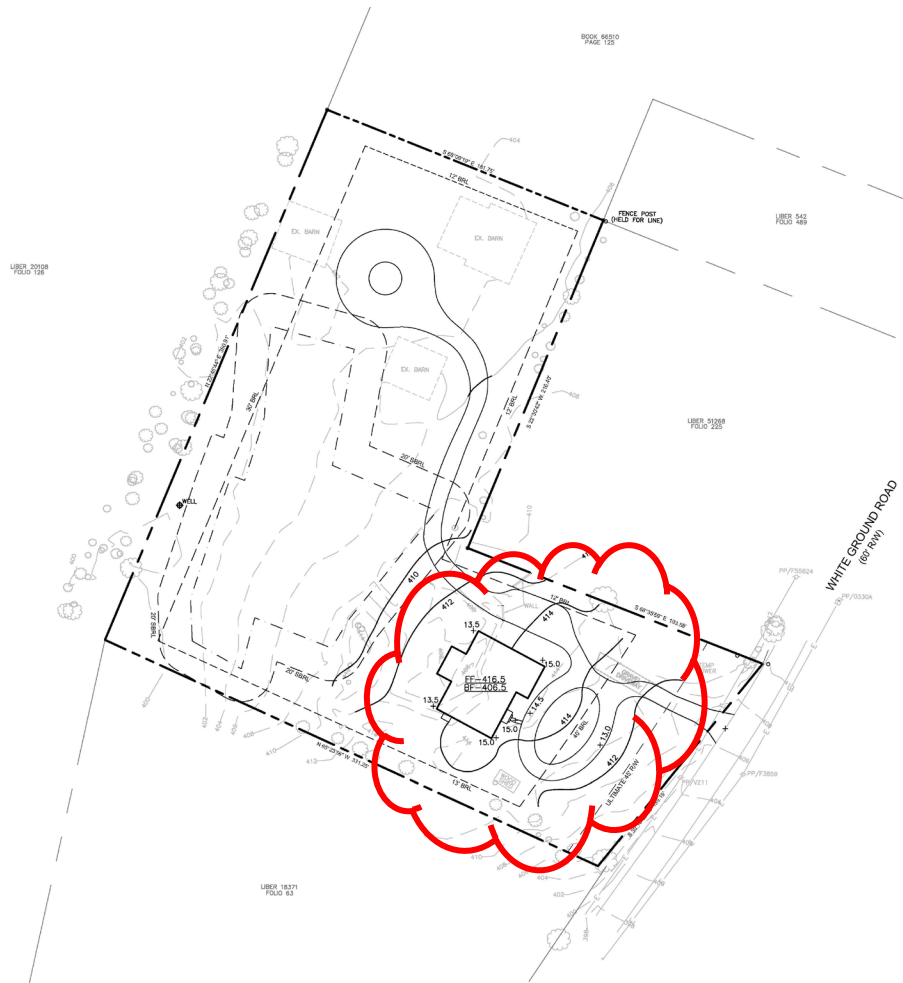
The proposed house footprint is clouded in red in the site plan of the property set back about 100 feet from the right of way.
